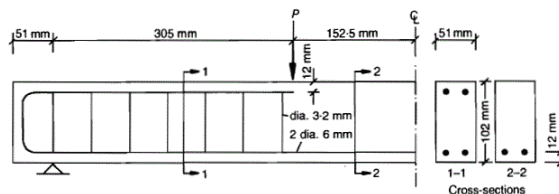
Load scheme, boundary condition and geometry of concrete beam
